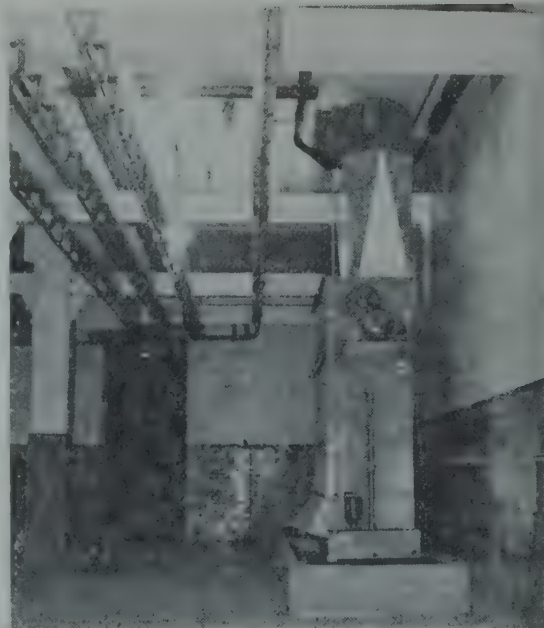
Typical Unit Cooler Installation in a Beef Chilling Cooler, Utilizing the Space above the Rail Supporting Timbers as a Plenum Chamber.
